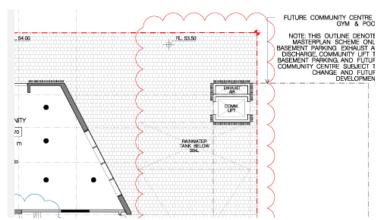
Stage 1 Mod 2 Approved Lower Ground Floor Plan extract
